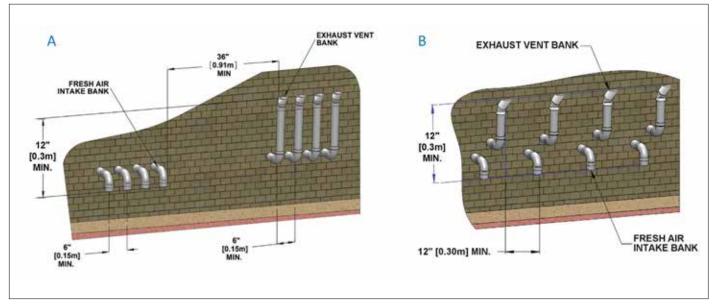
Sidewall vent termination options - multiple vent piping configurations
